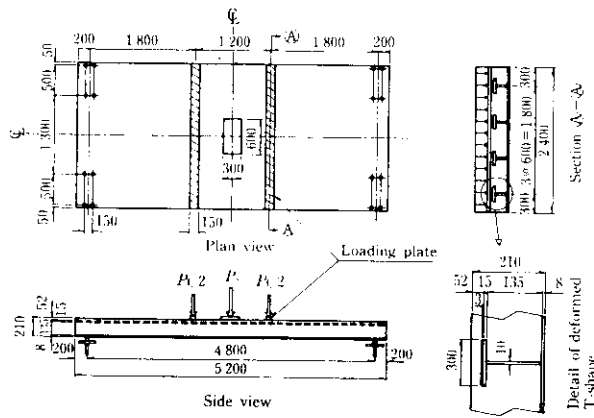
Dimensions of composite slab specimen for high-cycle fatigue test
